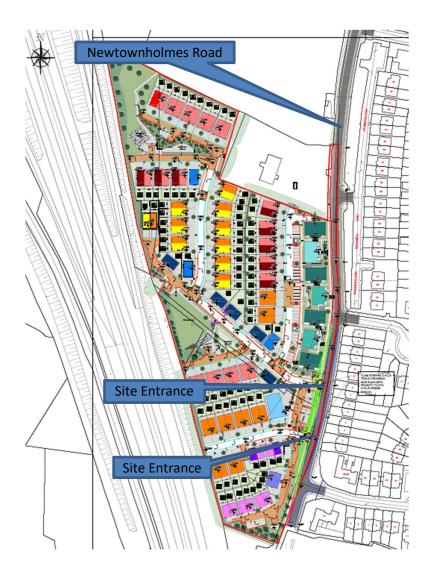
Site Access For Construction Traffic on Newtownholmes Road
